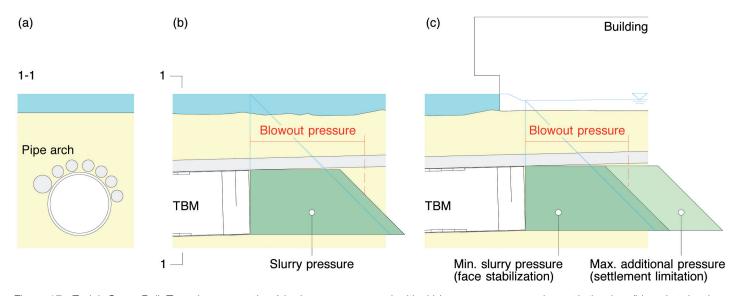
Zurich Cross Rail. Tunnel cross section (a), slurry pressure and critical blowout pressure underneath the river (b) and at the river bank (c)
